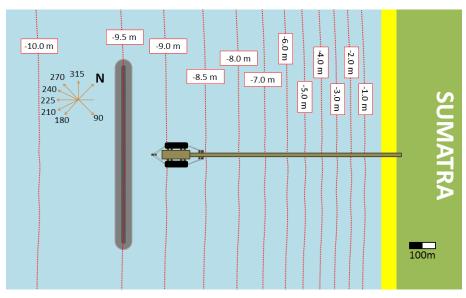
Plan view of bathymetry lines at project location (reference design breakwater)
